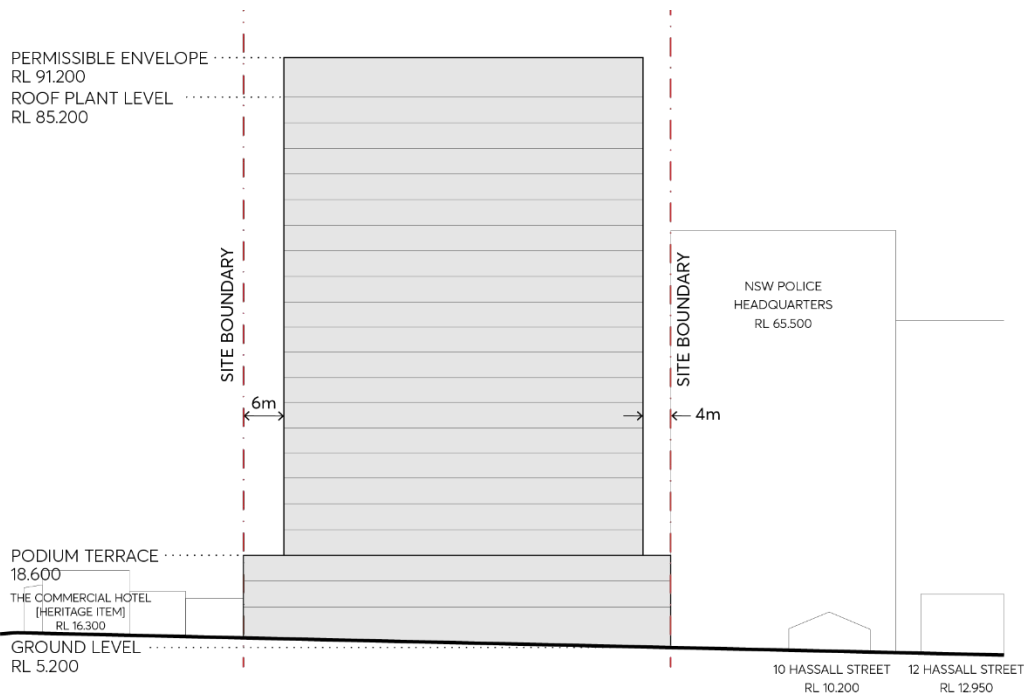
Hassall Street (southern) elevation illustrating the maximum building envelope
